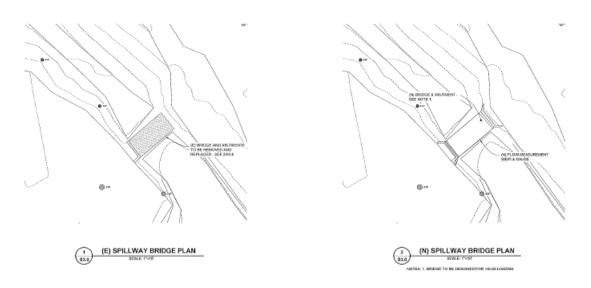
SPILLWAY PRELIMINARY PLANS
